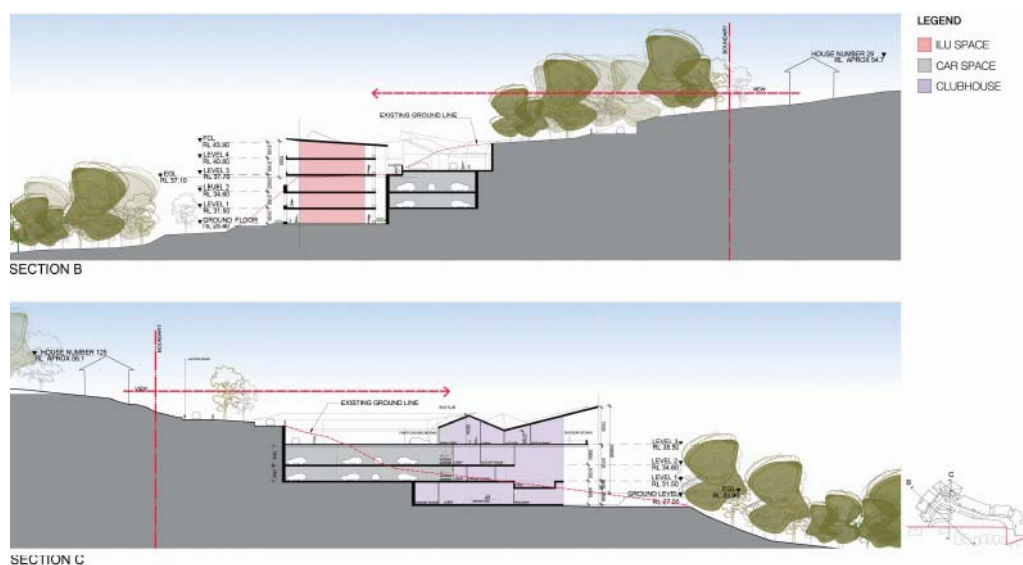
Section drawings from the proposed architectural scheme (source: Marchese Partners).
